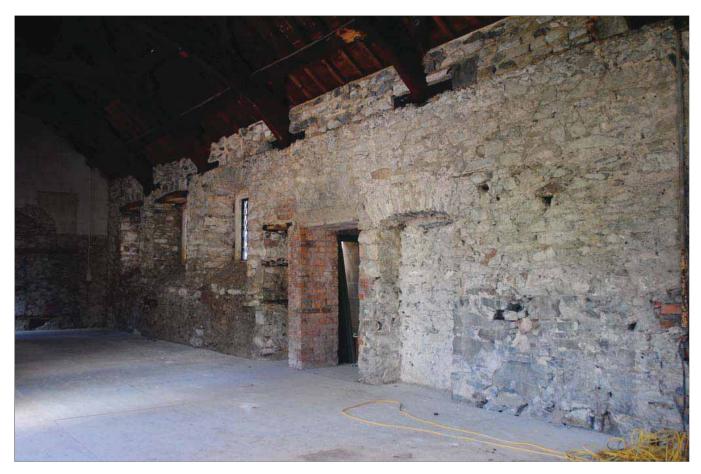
Old Grammar School internal - East Facing Internal Elevation of the School Hall from the North East
